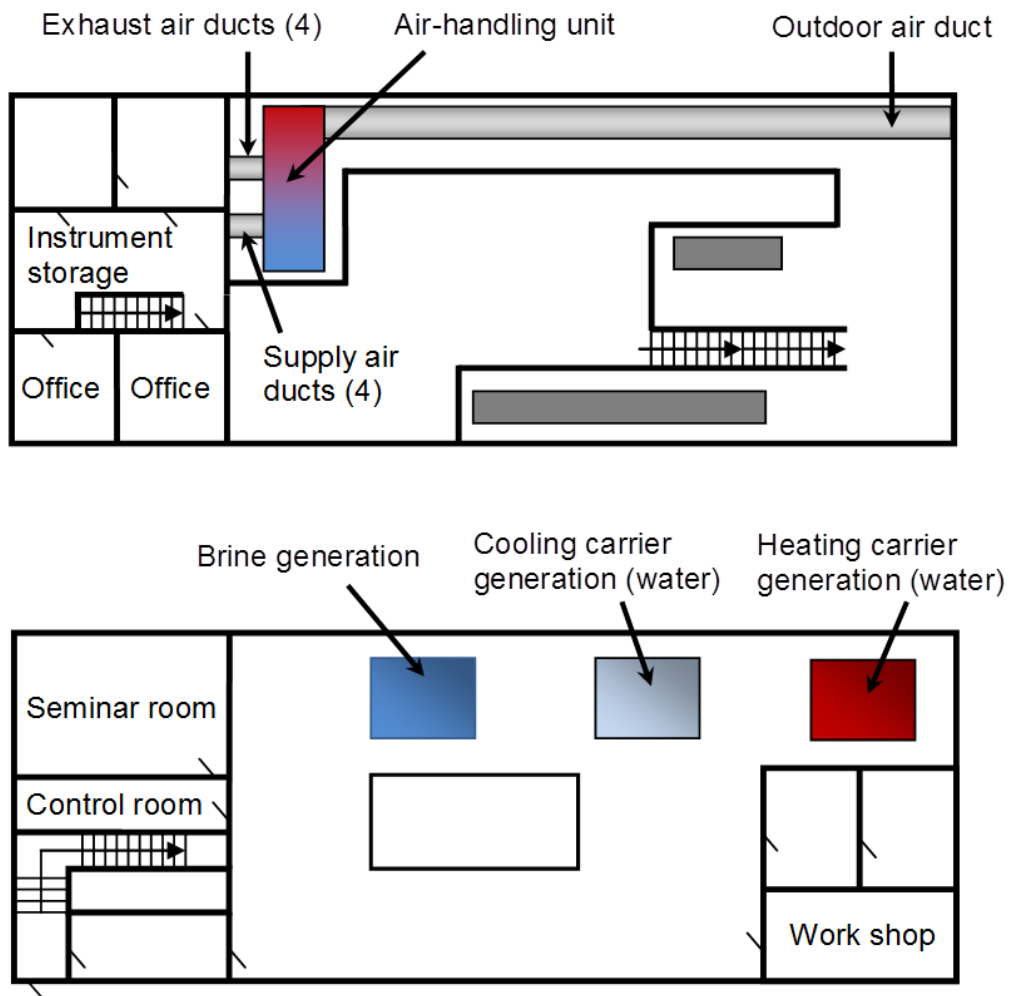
Schematic layout of the laboratory building. Bottom: entrance floor, top: 2nd level and entresol.
